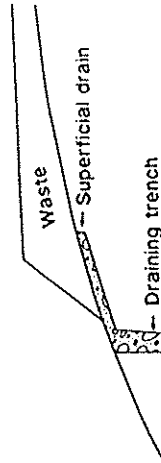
Waste disposal in embankment with an underlying superficial drain and a draining deep trench located downwards.
